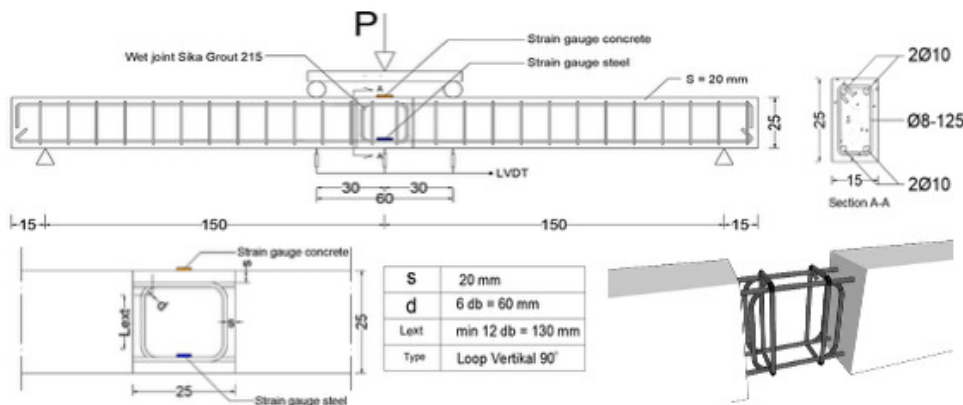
Design, reinforcement details, loading scheme, and instrumentation layout for the PB-LP. All dimensions are in mm; a scale bar is included.
